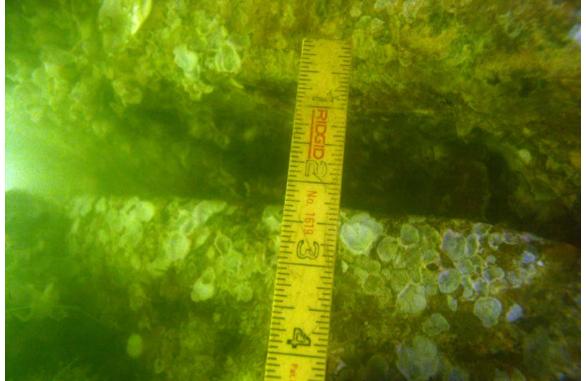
VOID IN THE NORTHWEST 66 IN. DIAMETER PILE AT BENT 197 UNDER THE WEST "NEW" CAP
